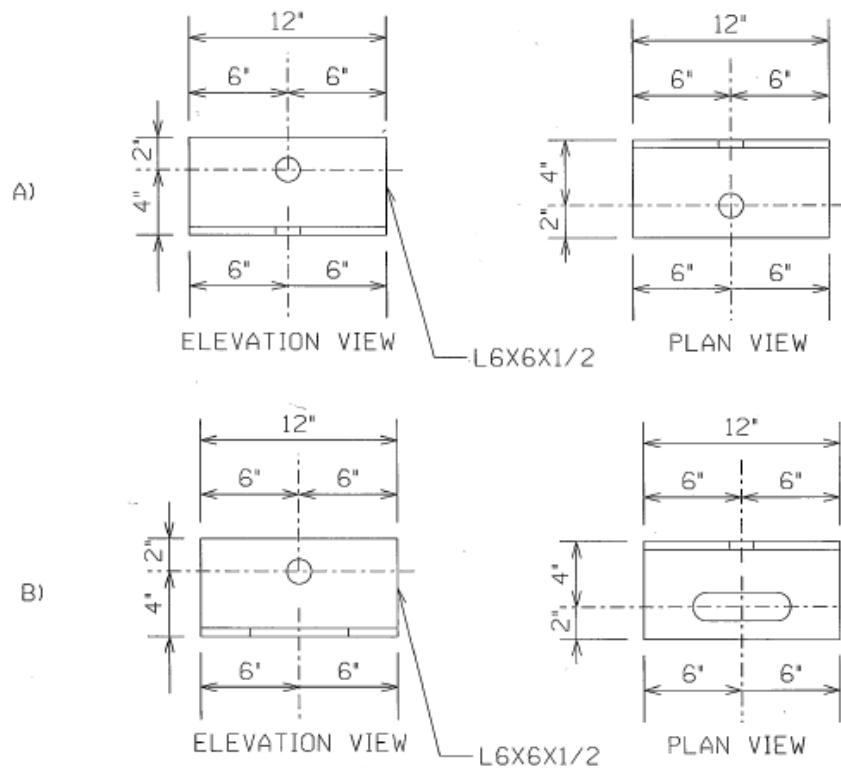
Oseligee Creek Bridge Bent 2 & 3 Connections
